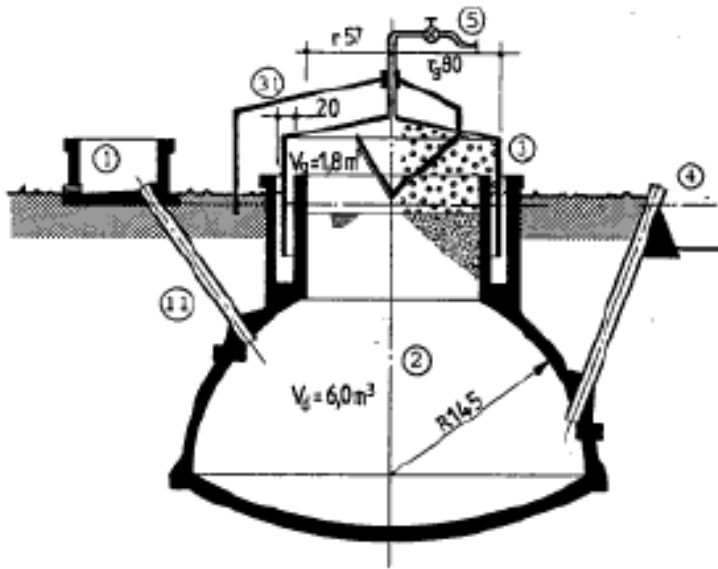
Floating drum biogas system with a water-jacket and external guide frame
